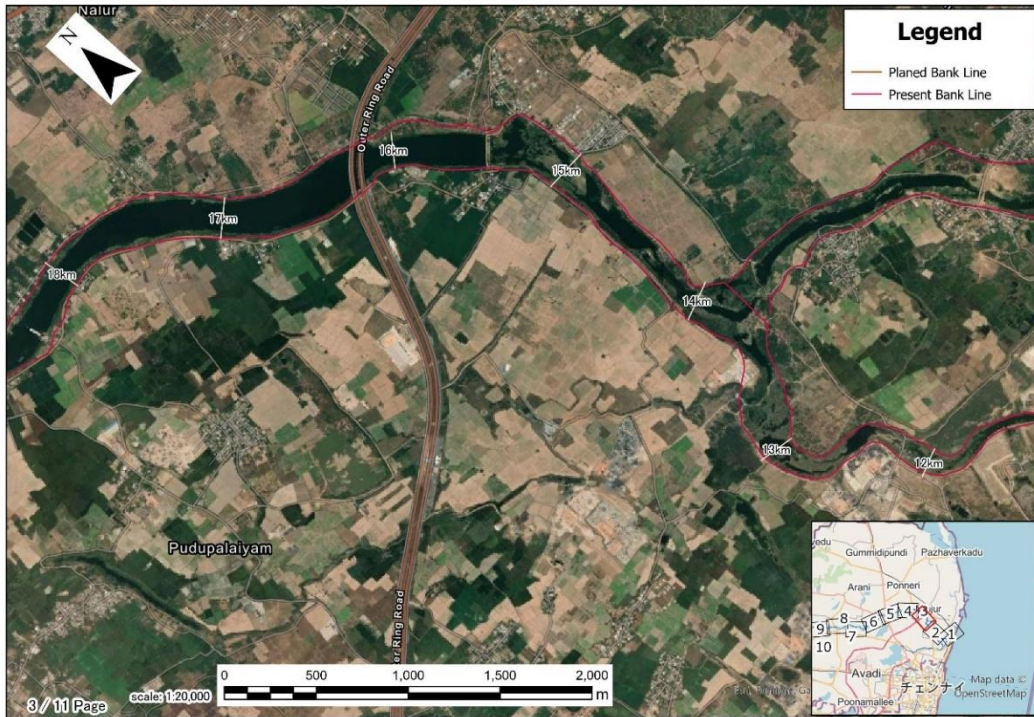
Cooum River Excavation River Channel Plan (6/7)
